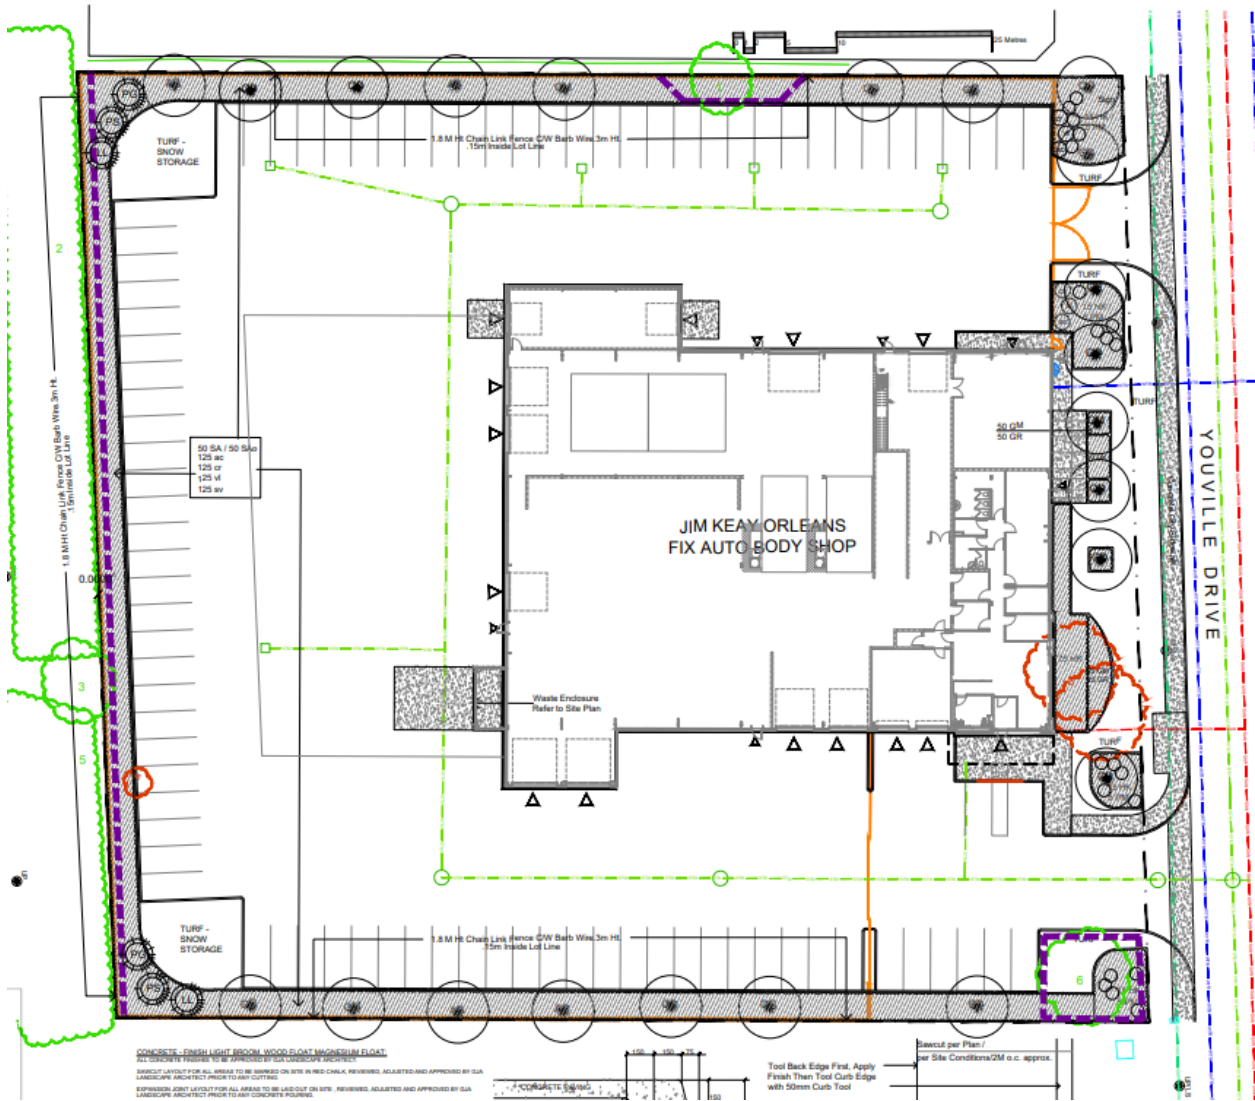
Site Development Plan (including building layout, parking spaces and landscaping)
